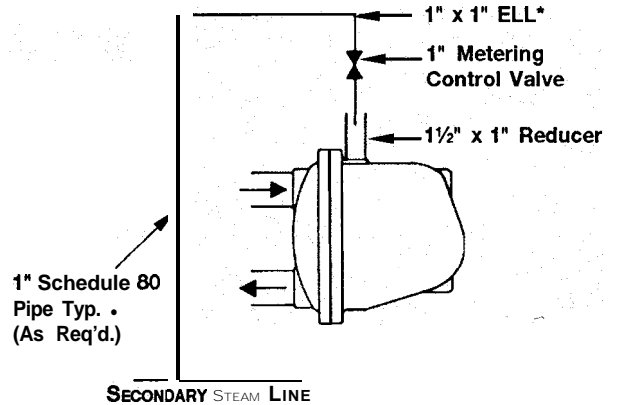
Piping arrangement when secondary steam is collected and reused in heat transfer equipment.
